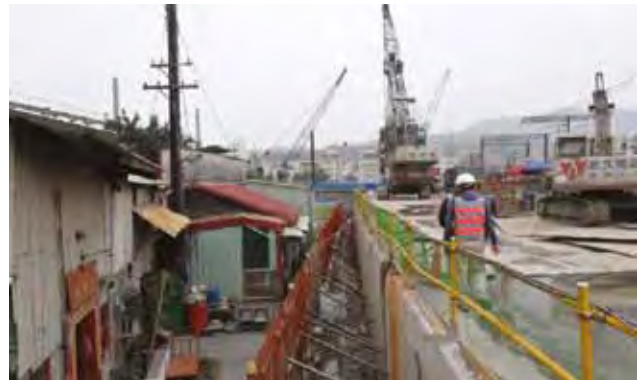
Slurry wall construction with horizontal and vertical site constraints, and modified slurry wall equipment
